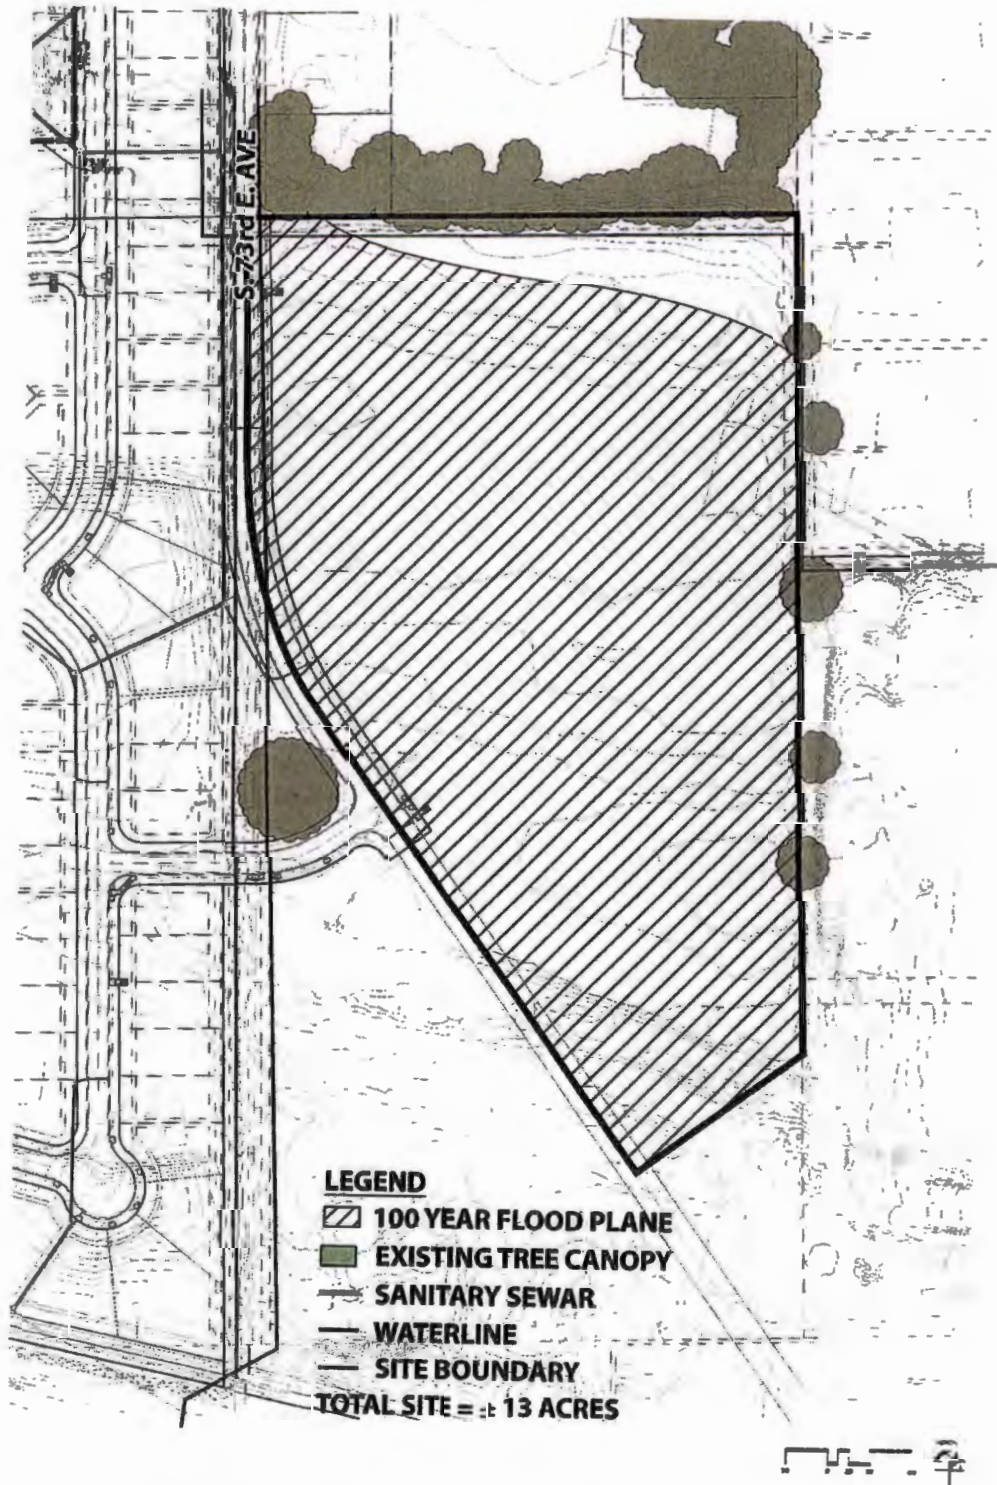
EXHIBIT D: PHASE III PROPOSED CONCEPT PLAN
